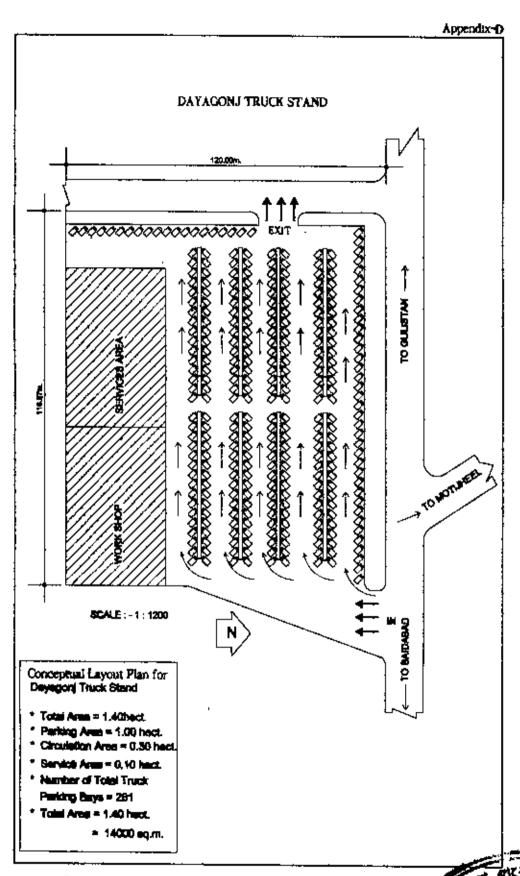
Conceptual Layout Plan for Dayagon; Truck Terminal
